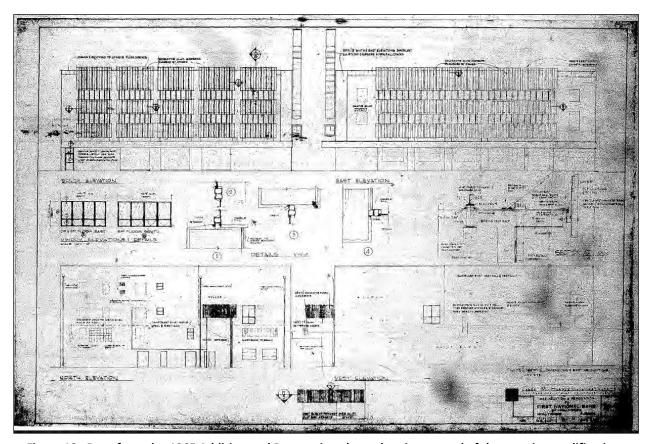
Page from the 1965 Addition and Renovation plans, showing several of the exterior modifications such as the removing and replacement of stucco, addition of screens, and window alterations (City of Hollywood Records and Archives).
